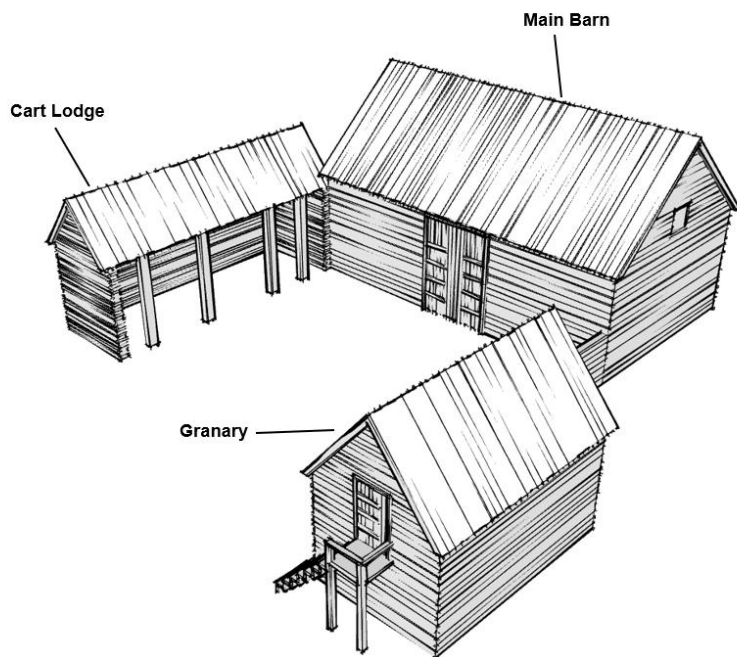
A redundant group of farm buildings as existing. Showing a main barn, cart lodge and granary.
